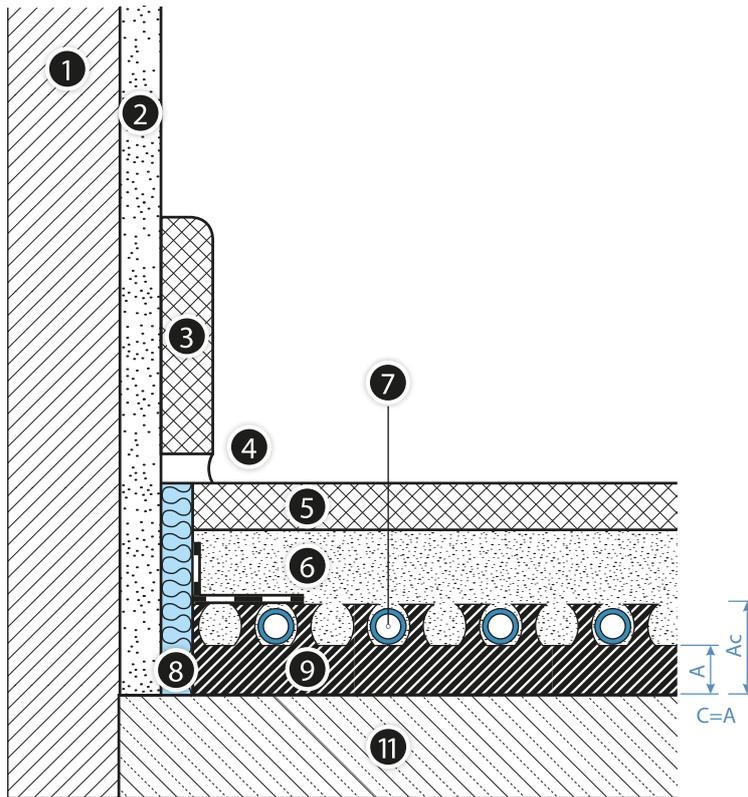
Floor heater with KAN-therm Profil System board and supplementary insulation on the ceiling above internal not heated room and on the ceiling in contact with outside air
